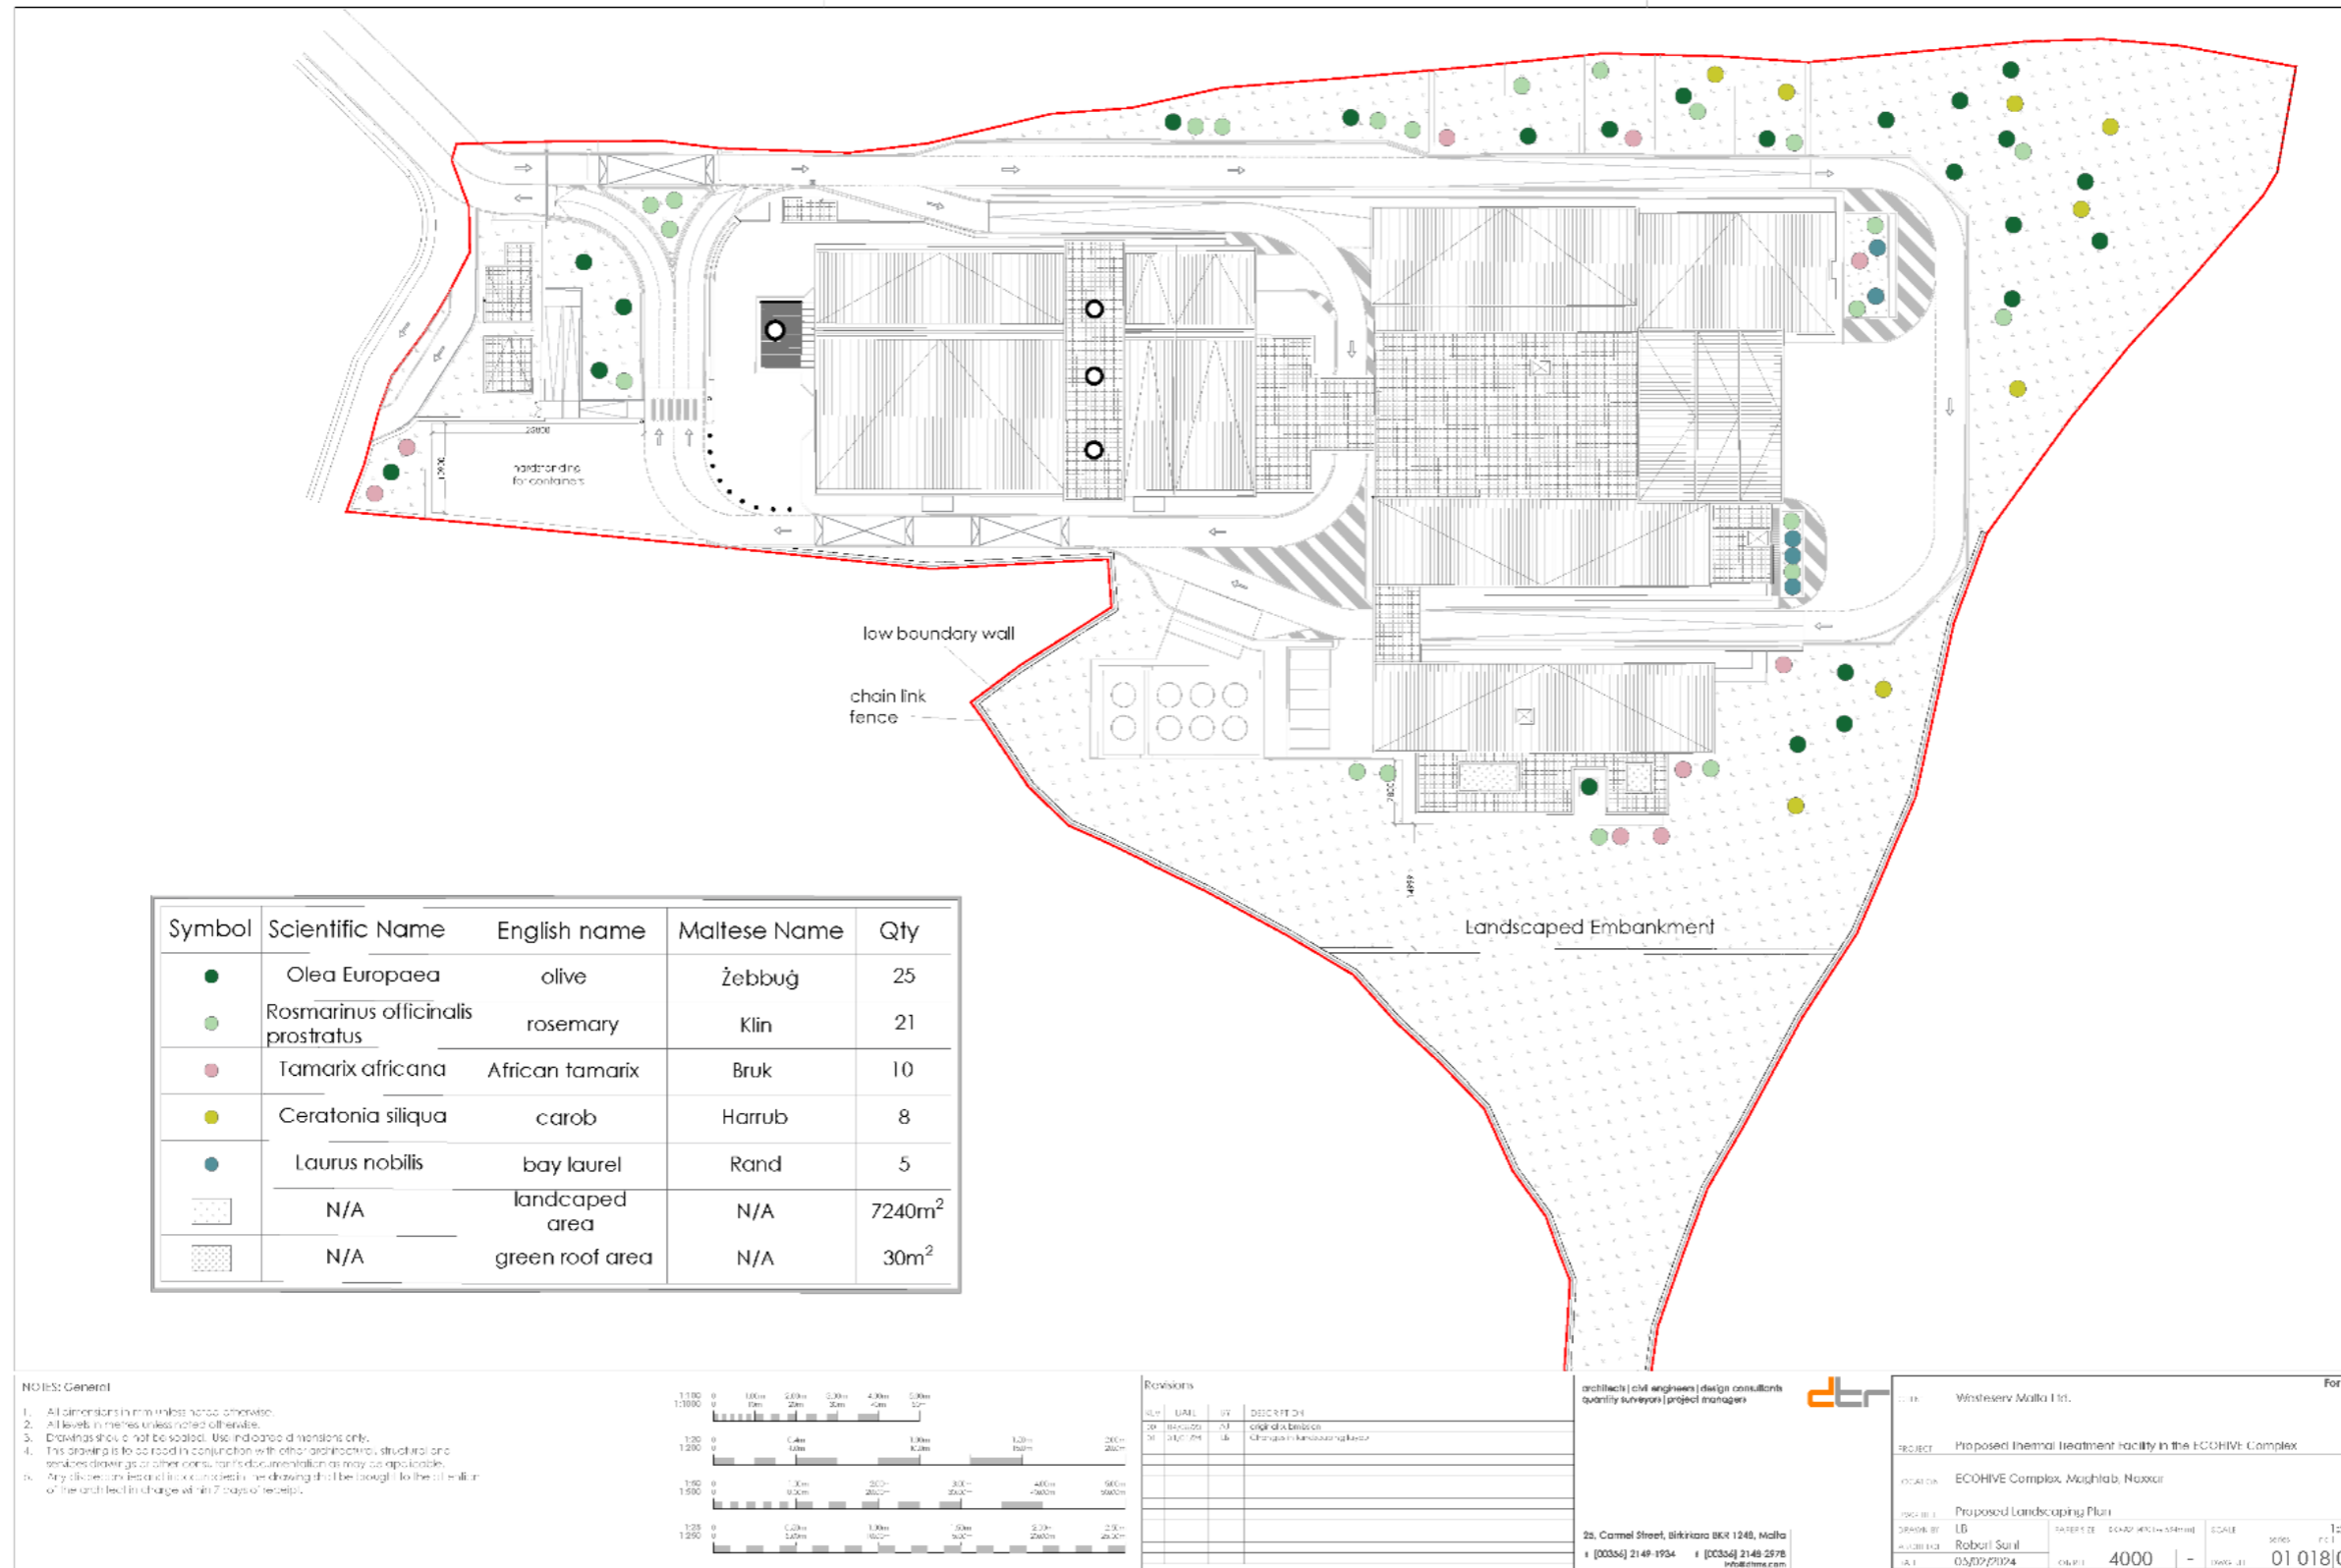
LARGE-SCALE PROPOSED LANDSCAPING PLAN
